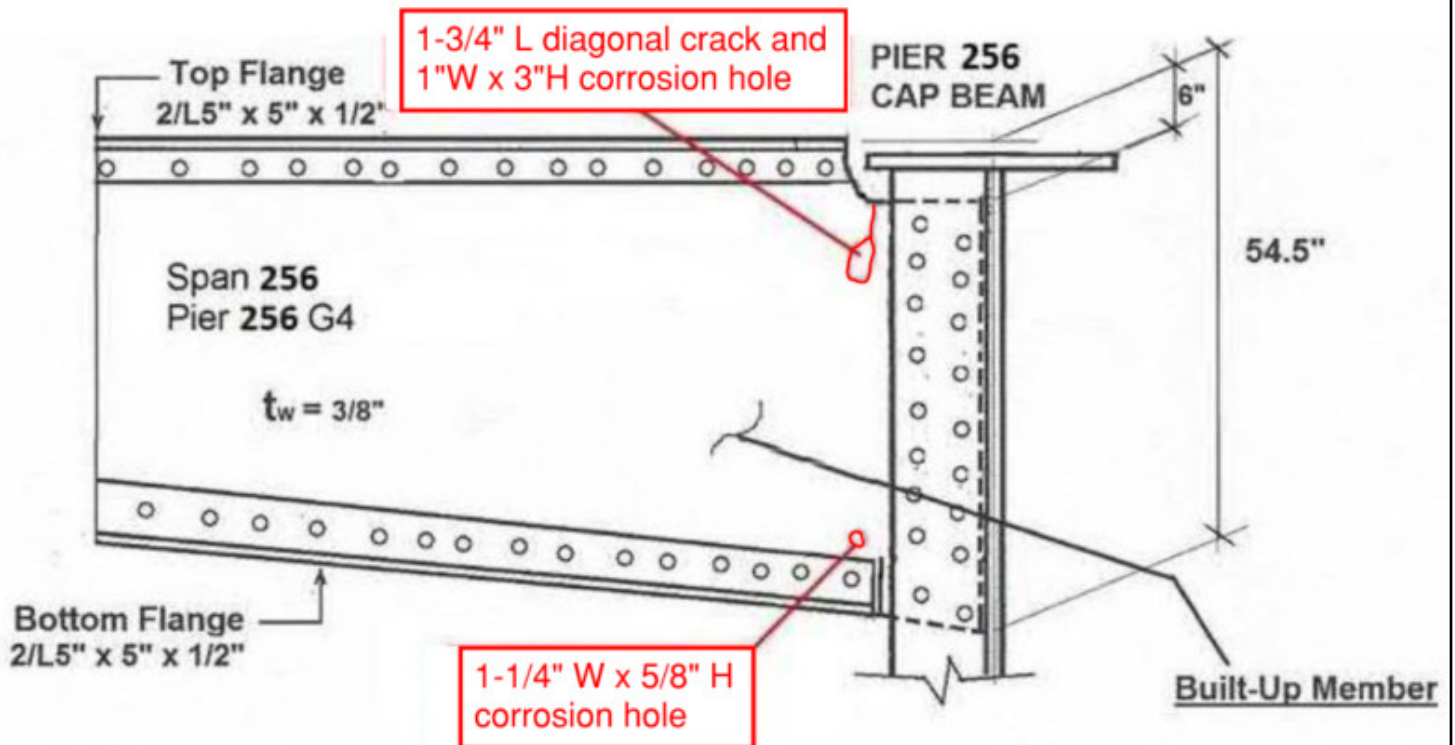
Photo Filename: NB23U4W013 LOCATION PLAN.JPG
